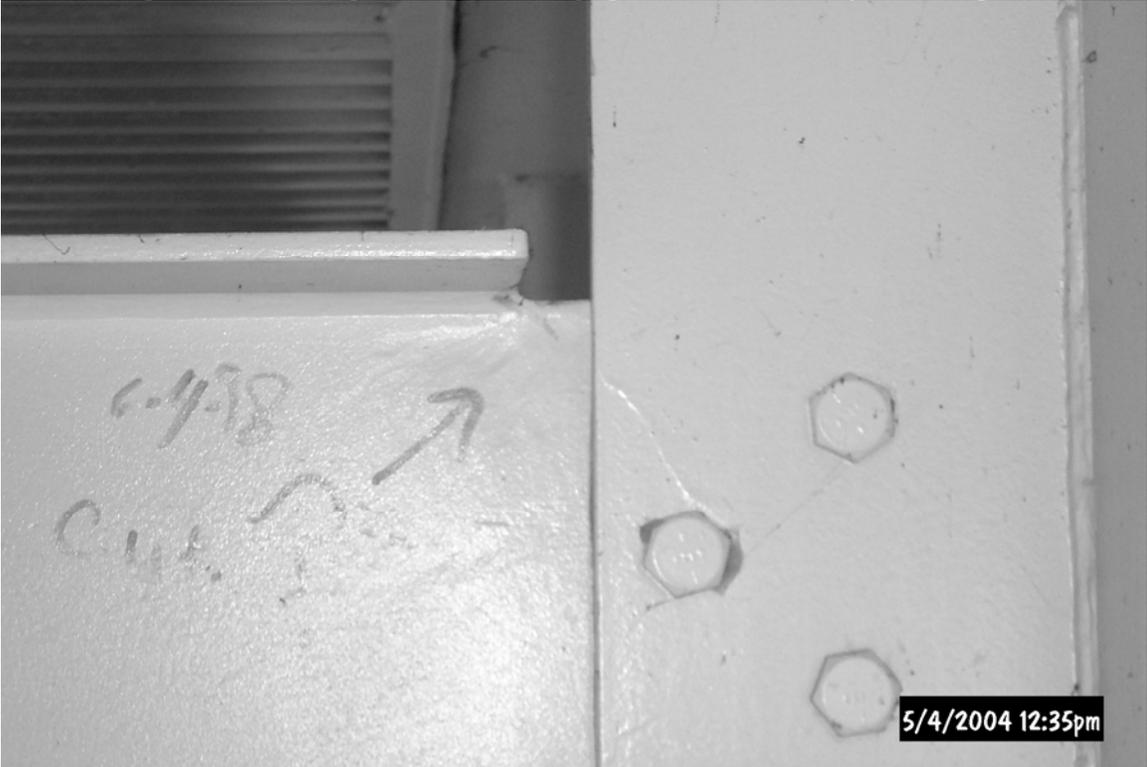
Insufficient cope radius (Bridge # 9320)
